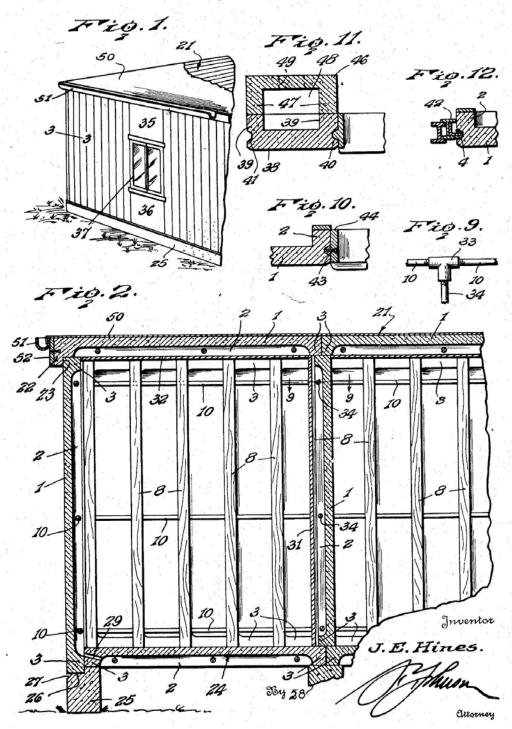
Precast Concrete Structural System of Ramsey Homes (Hines 1942)
